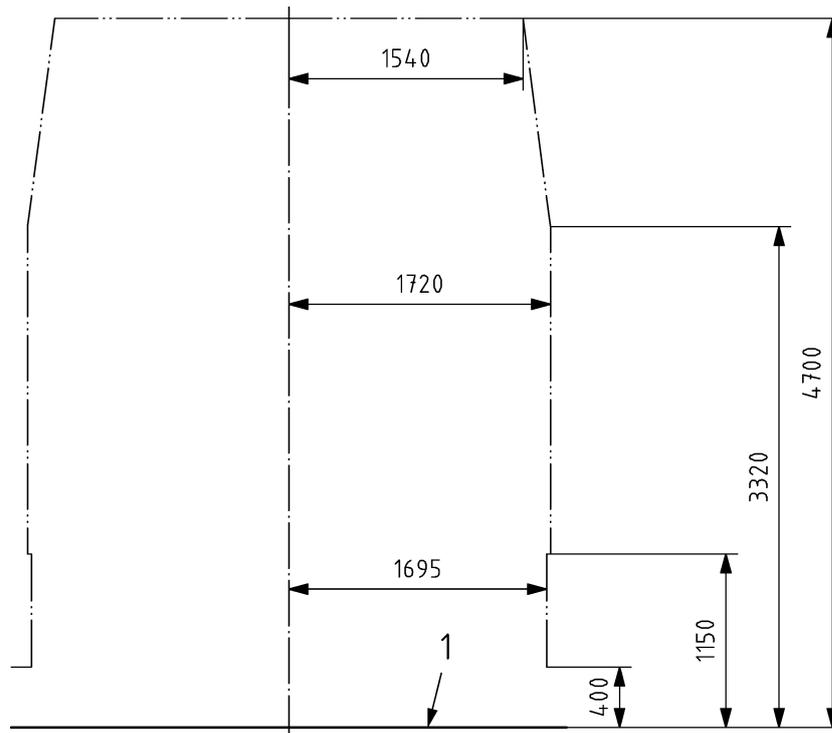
Reference profile of the upper parts of kinematic gauge GEB16
